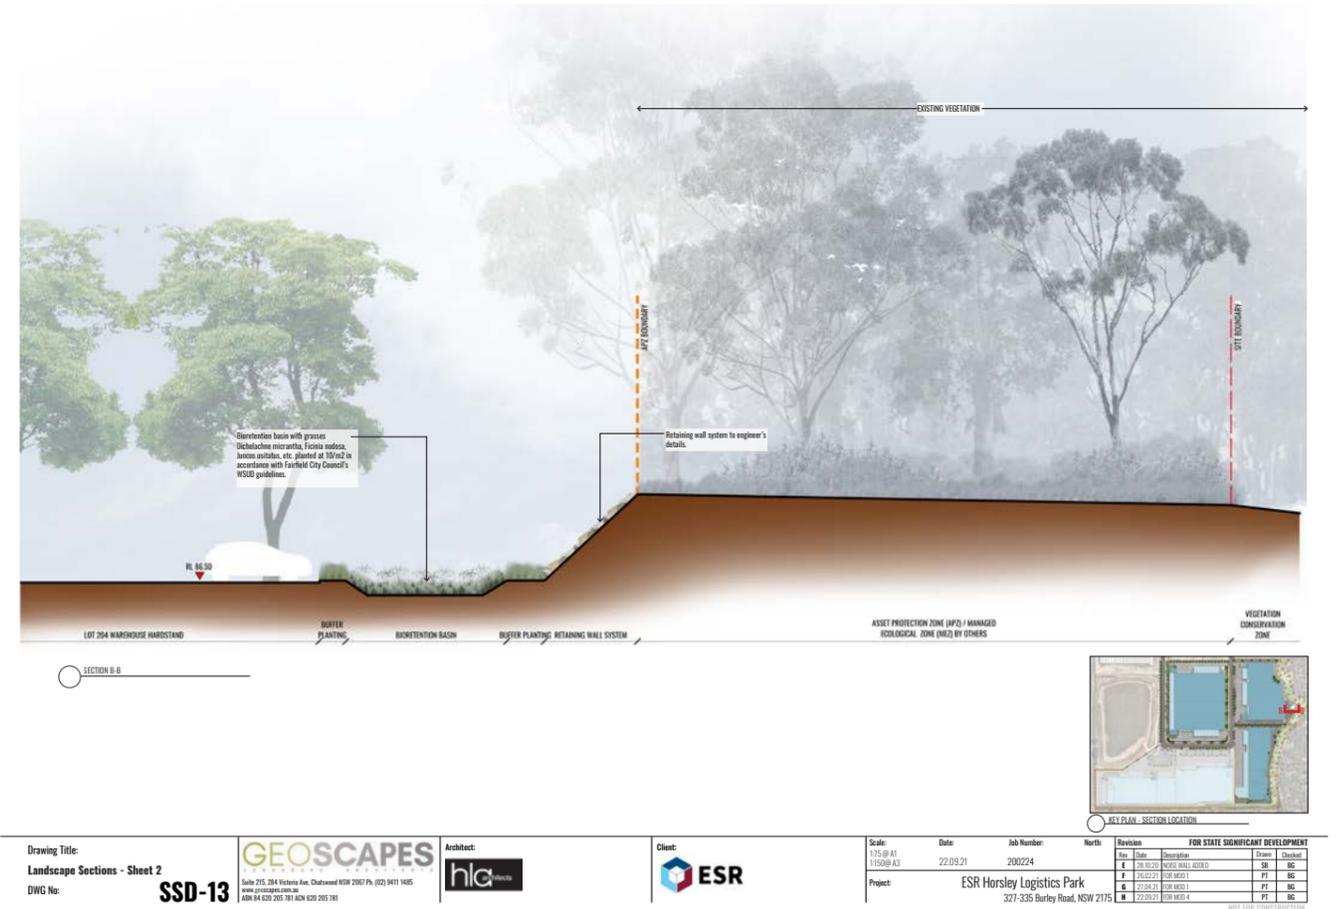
Landscape Sections - Sheet 2 (Source: Geoscapes)
